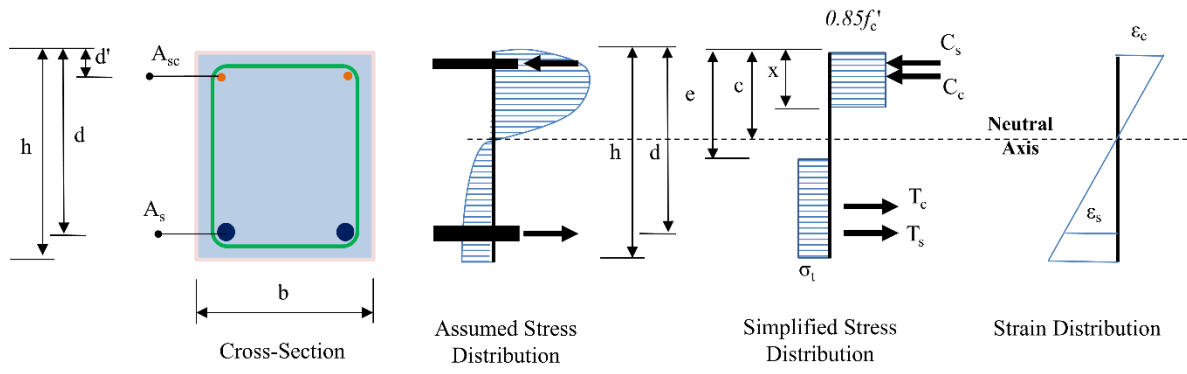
Design assumptions for reinforced fibrous concrete beams.
